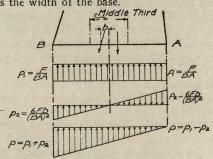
Diagram of Moments for Masonry Retaining Wall.
